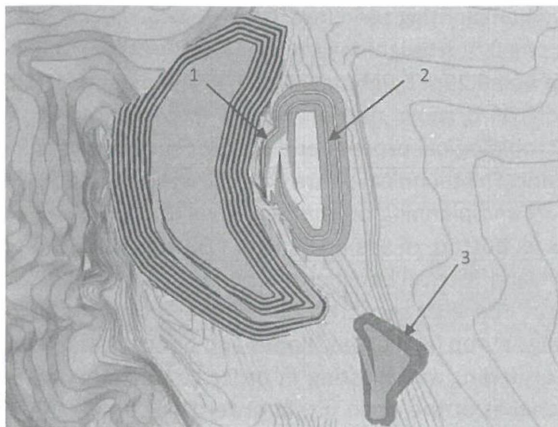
Spatial layout of facilities: open pit (1), tailings dumps (2) and landfill of soil material (3)
